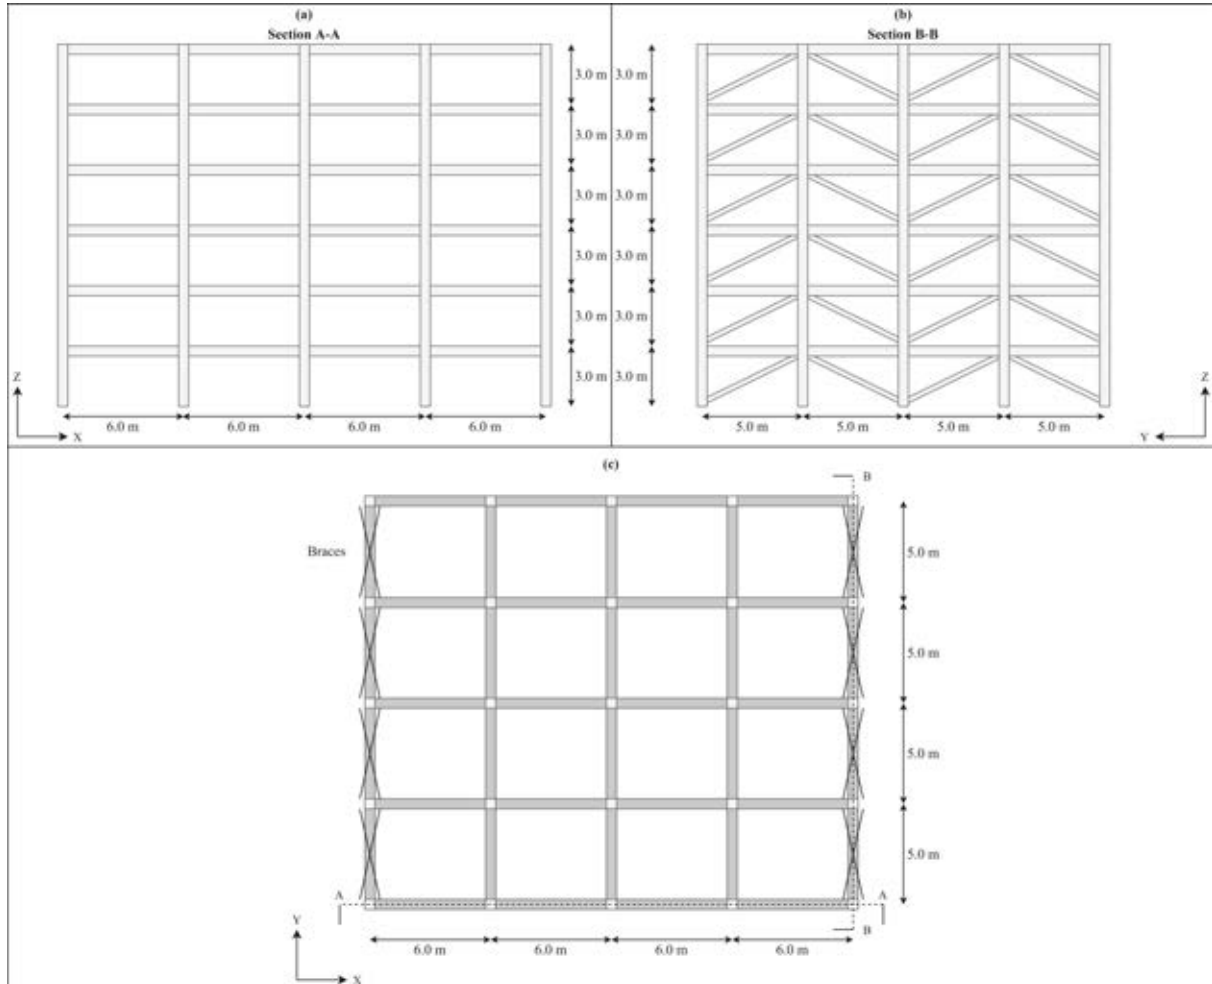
Structural layout: a) moment-resisting frame, b) concentric braced frame, c) plan-view of the building.
